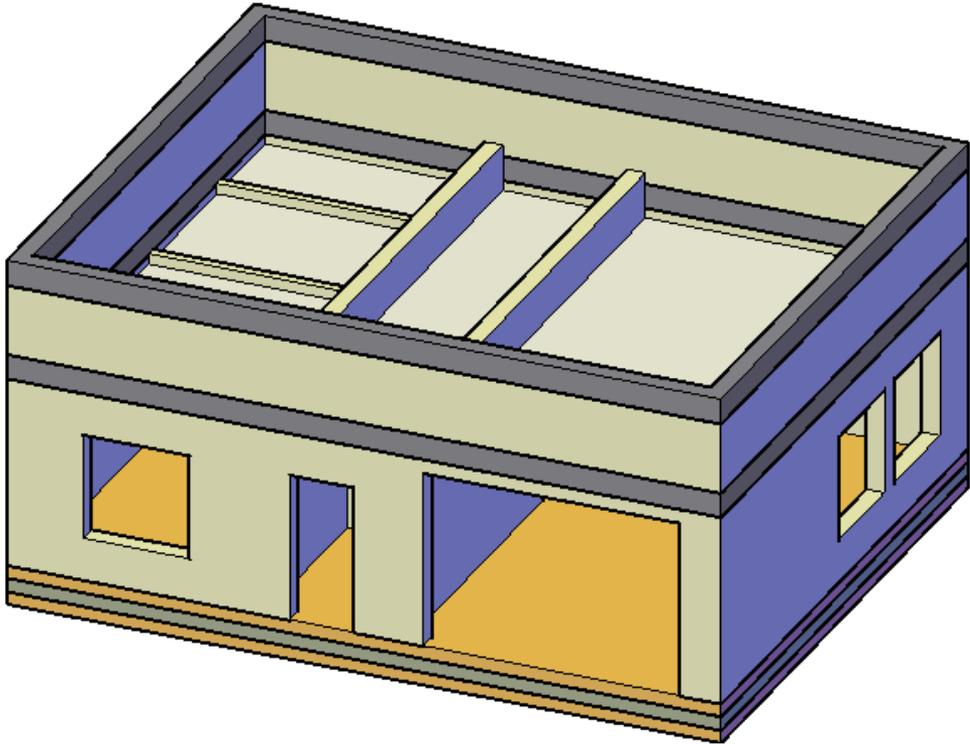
Knee wall with the ring beam ready for the roof construction
